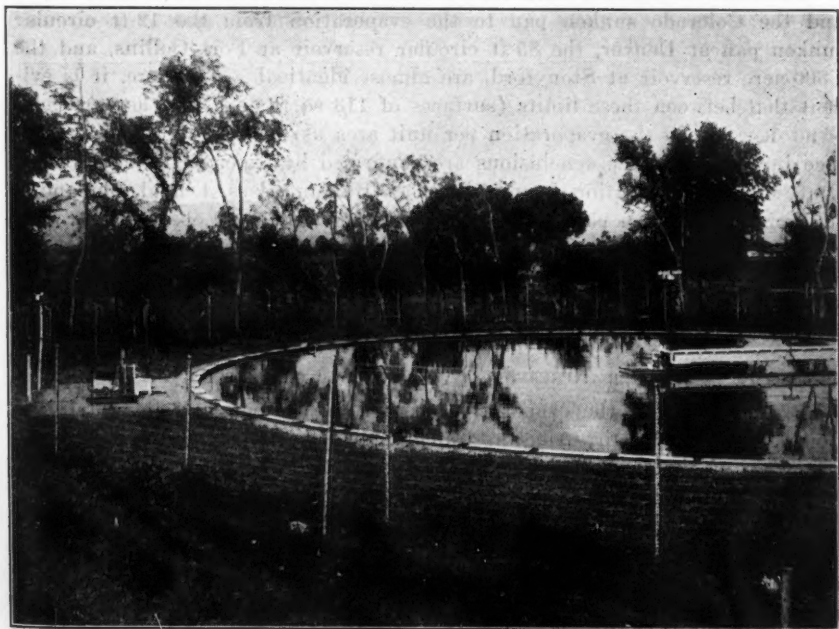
ARRANGEMENT OF EQUIPMENT FOR CONDUCTING EXPERIMENTS ON THE 85-FOOT CIRCULAR RESERVOIR AND VARIOUS STANDARD PANS AT FORT COLLINS, COLO.
